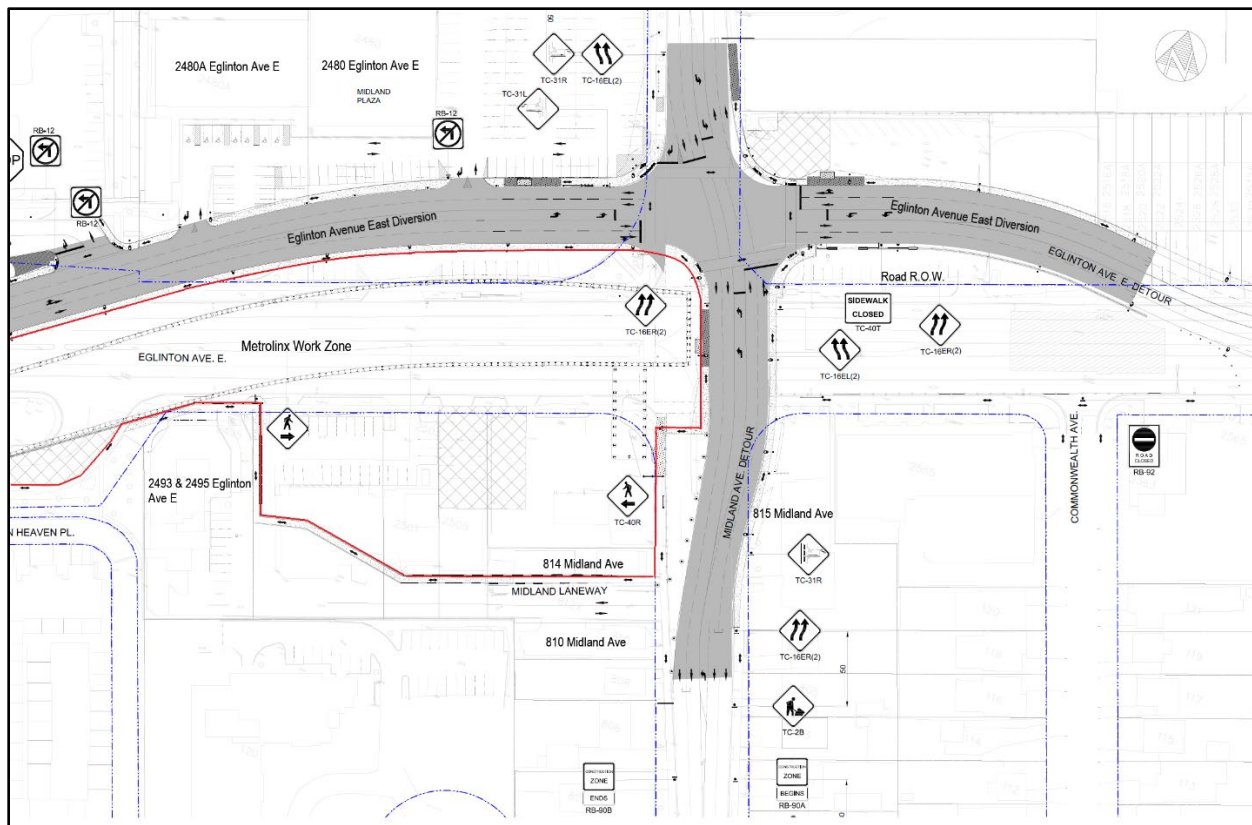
SSE-Kennedy Station Connection Construction – Road Diversion
